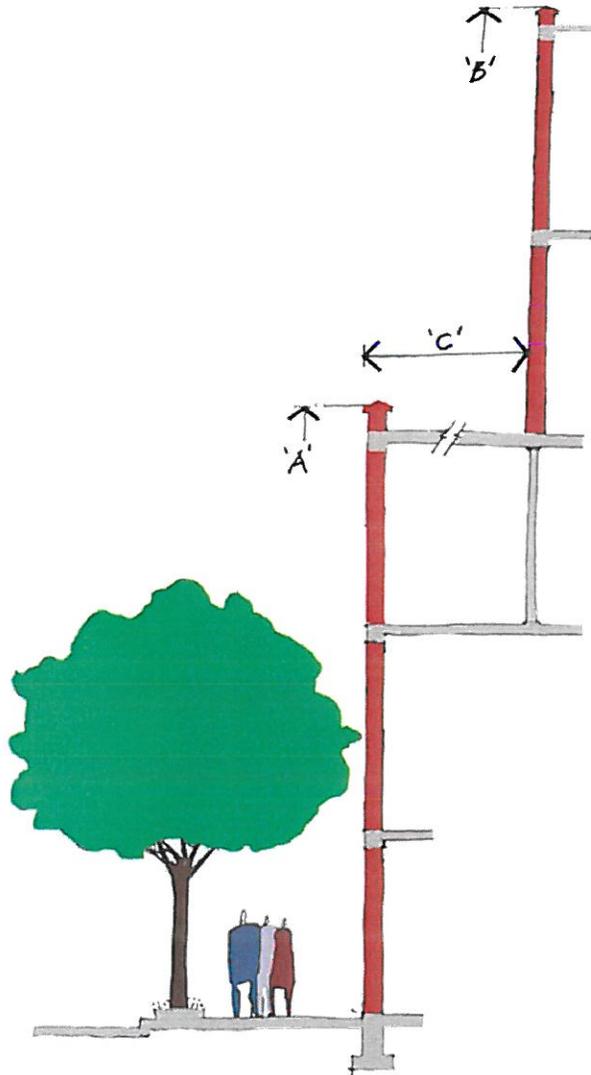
Illustrative Guidelines for Buildings Higher than Three Floors
